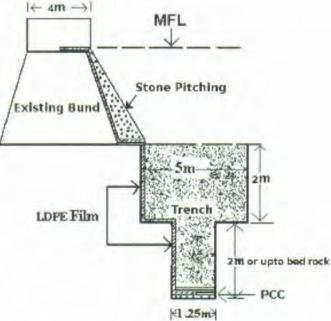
Cross section view of sub-surface dyke
